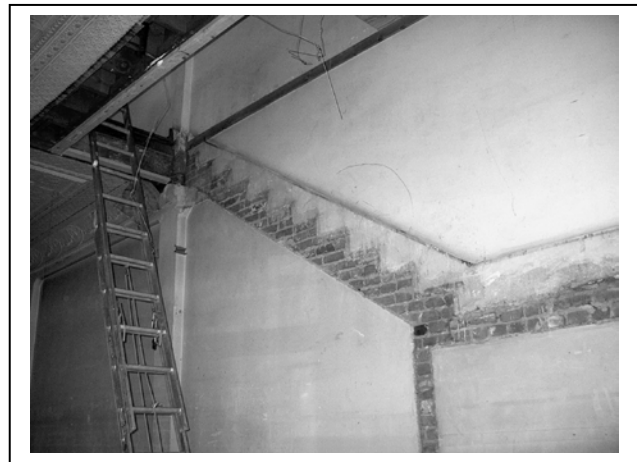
Ghost of former staircase and landing leading to 4th Street entry, located on west side of building.
